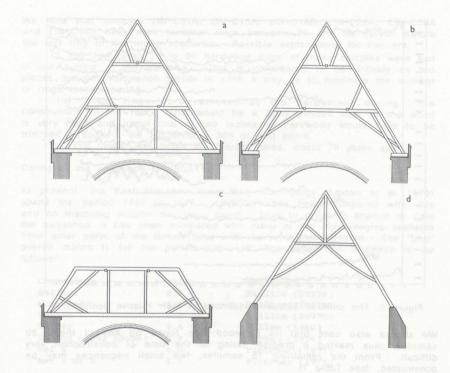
Lincoln Cathedral St. Hugh's Choir roof. (a) truss with tie beam (b) truss with bearers (c) half truss (d) truss adjacent to tower
